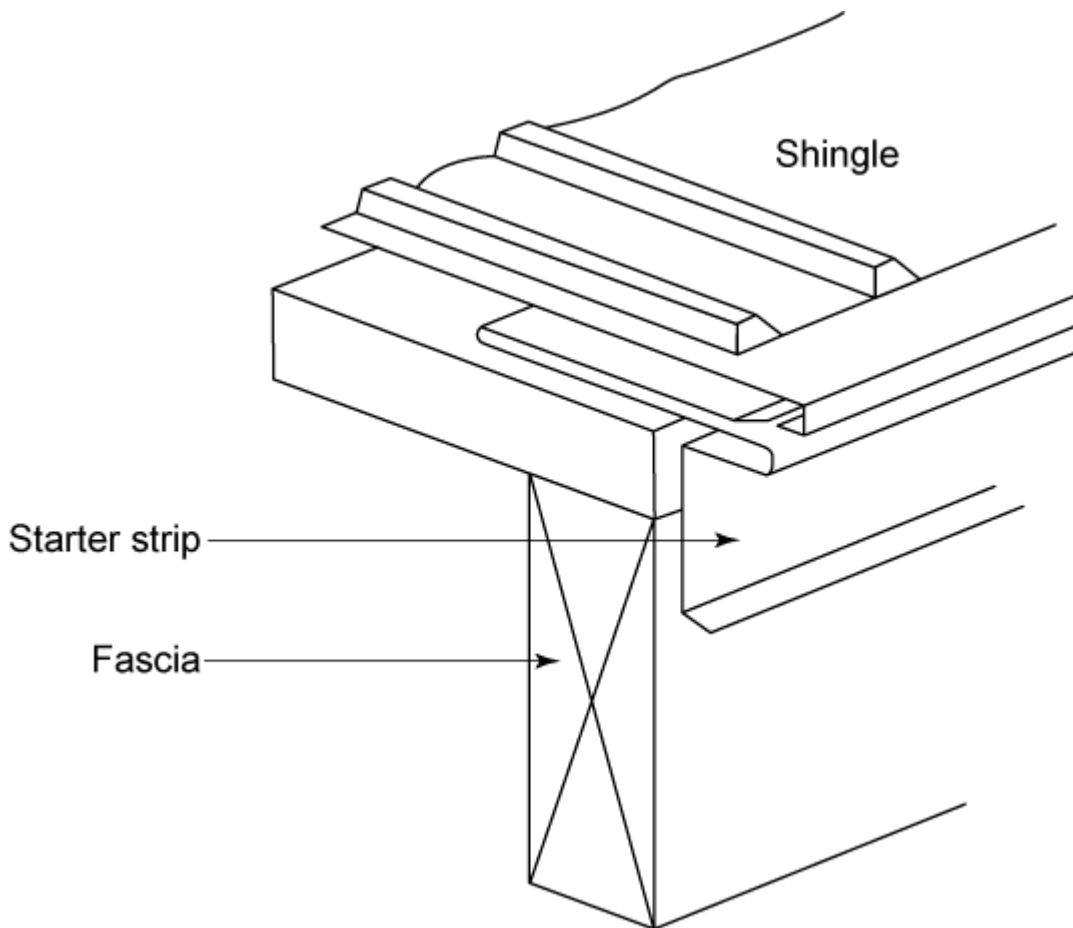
“Gerard Shingle, Granite Ridge, and Guardian Shingle” first course installation detail – staggered diagram
